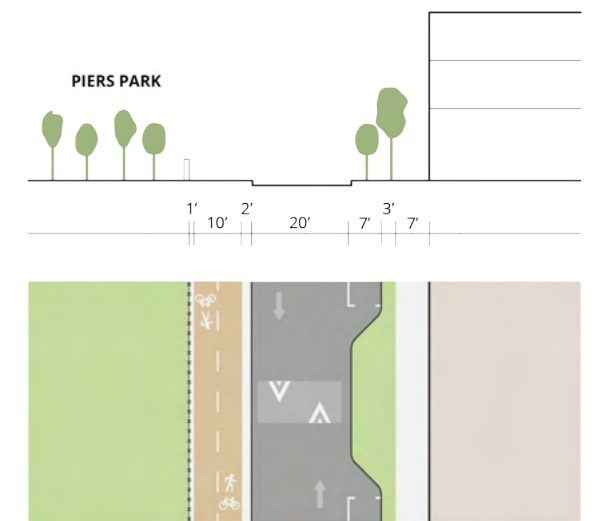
MARGINAL STREET SECTION - PROPOSED CONDITION FOR PUBLIC WAY
